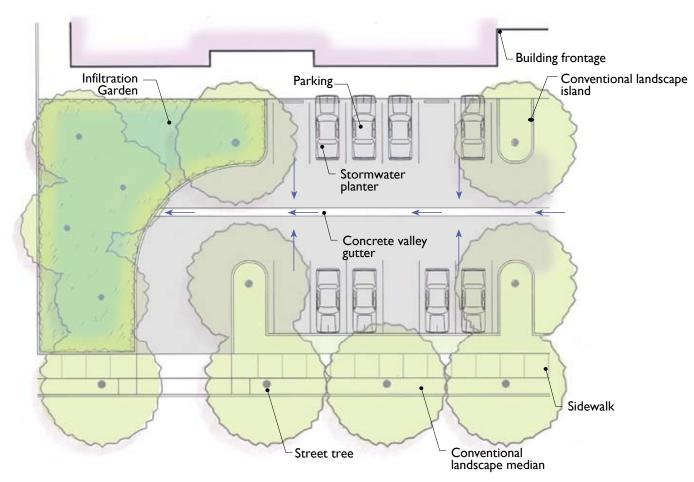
Parking Lot Infiltration Garden-Plan View
